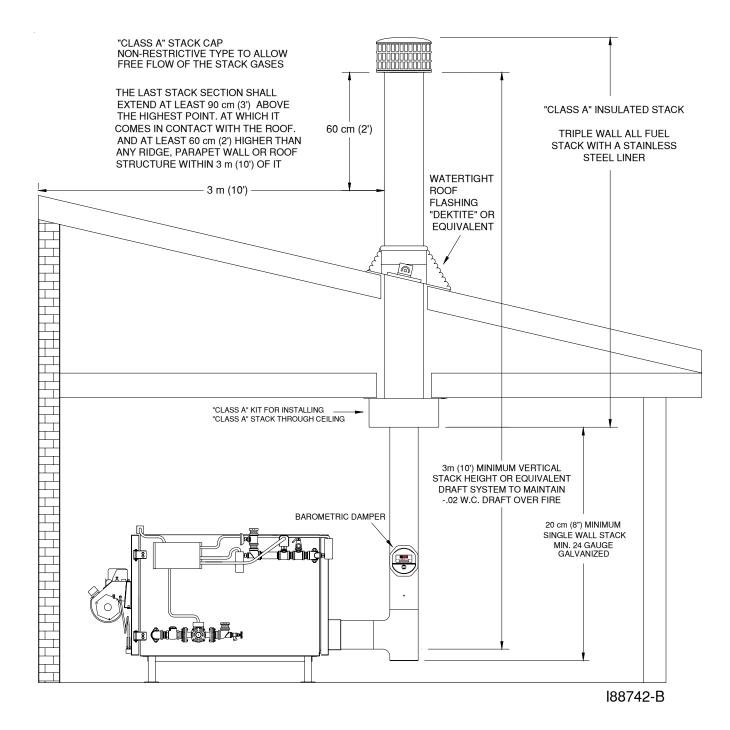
H - Installation of "Class A" Stack Through Roof/Ceiling (Single Boiler)
